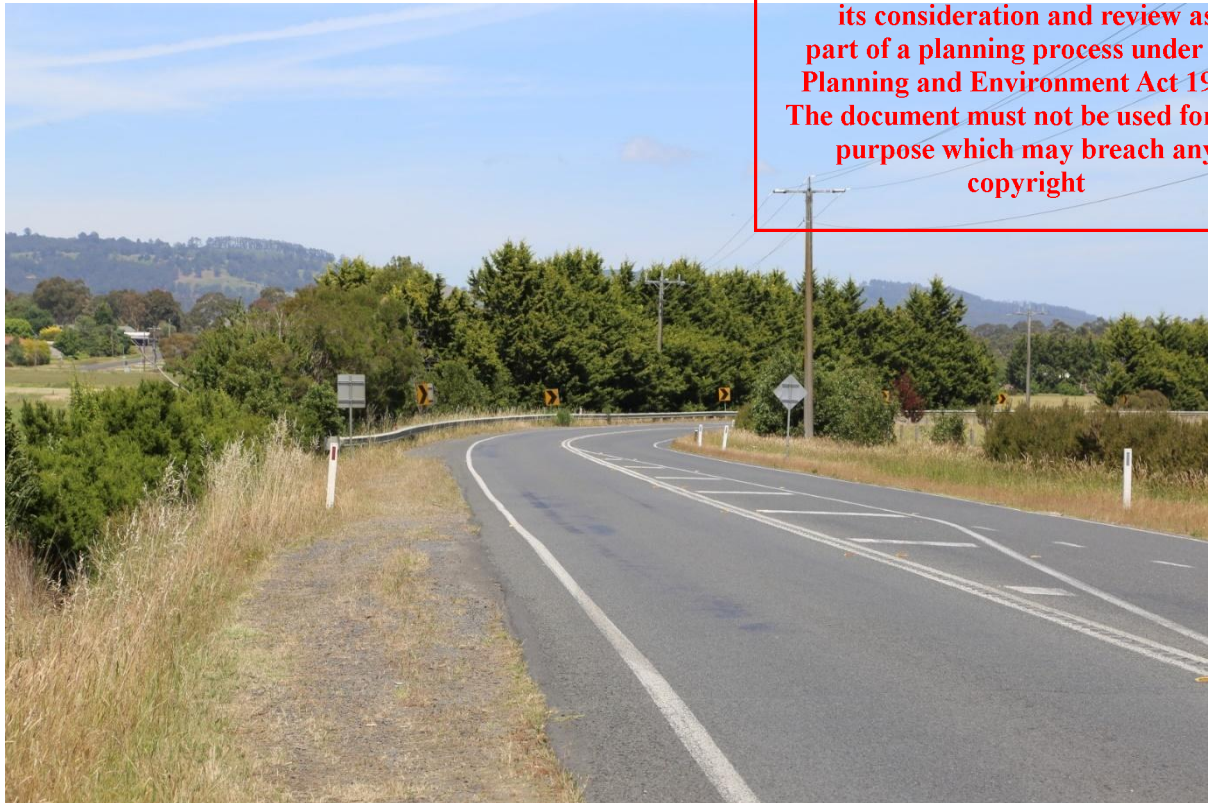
Typical roadside vegetation on Tramway Road to the south of the subject site.
